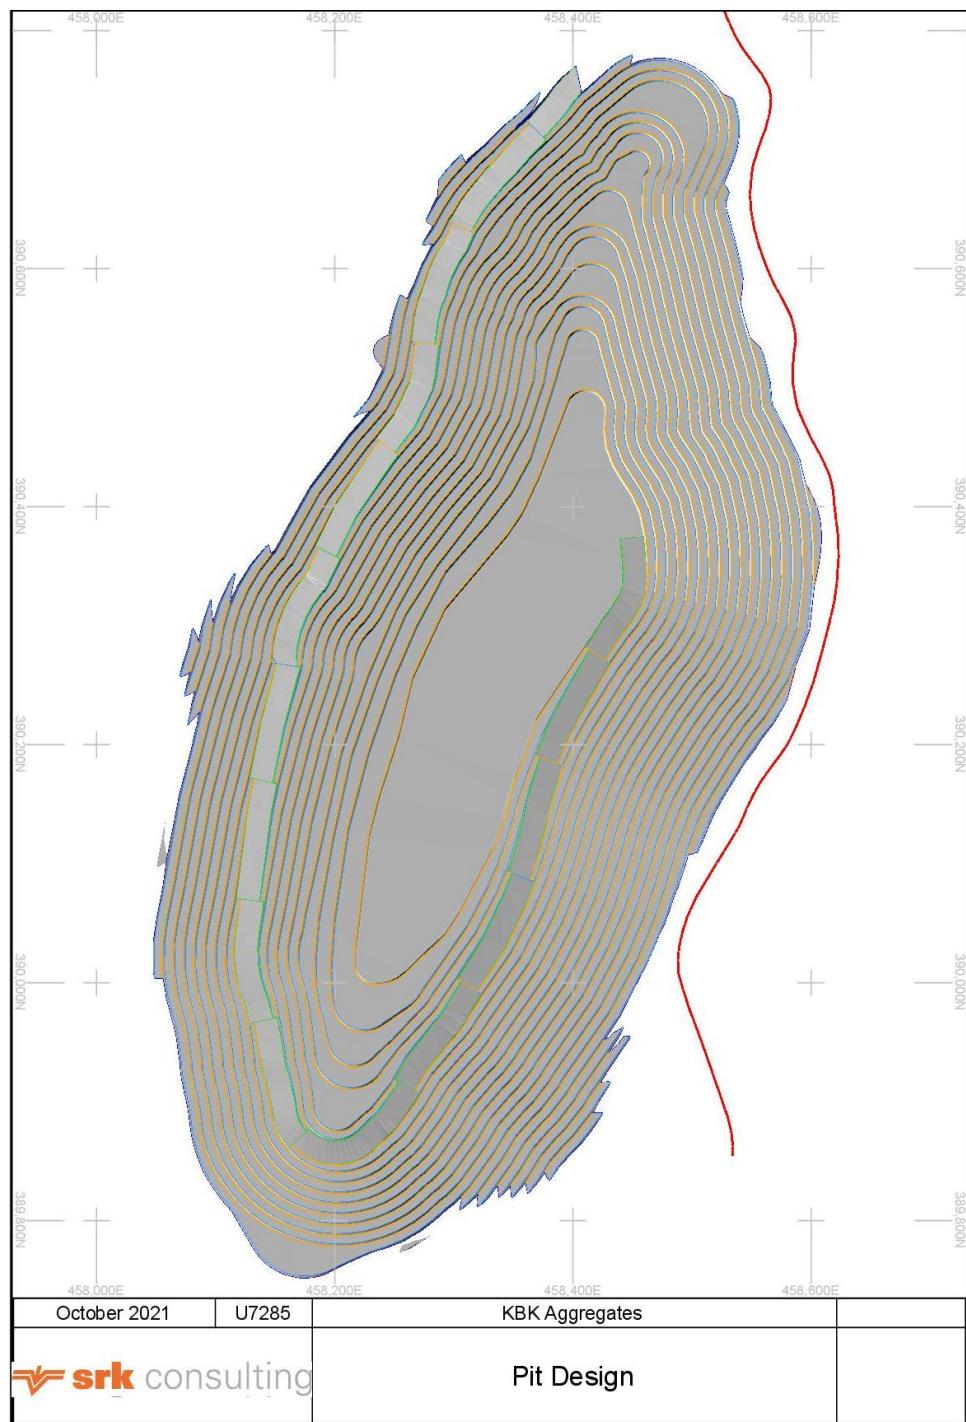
Proposed Pit Design with exit ramp to the north of the permit
